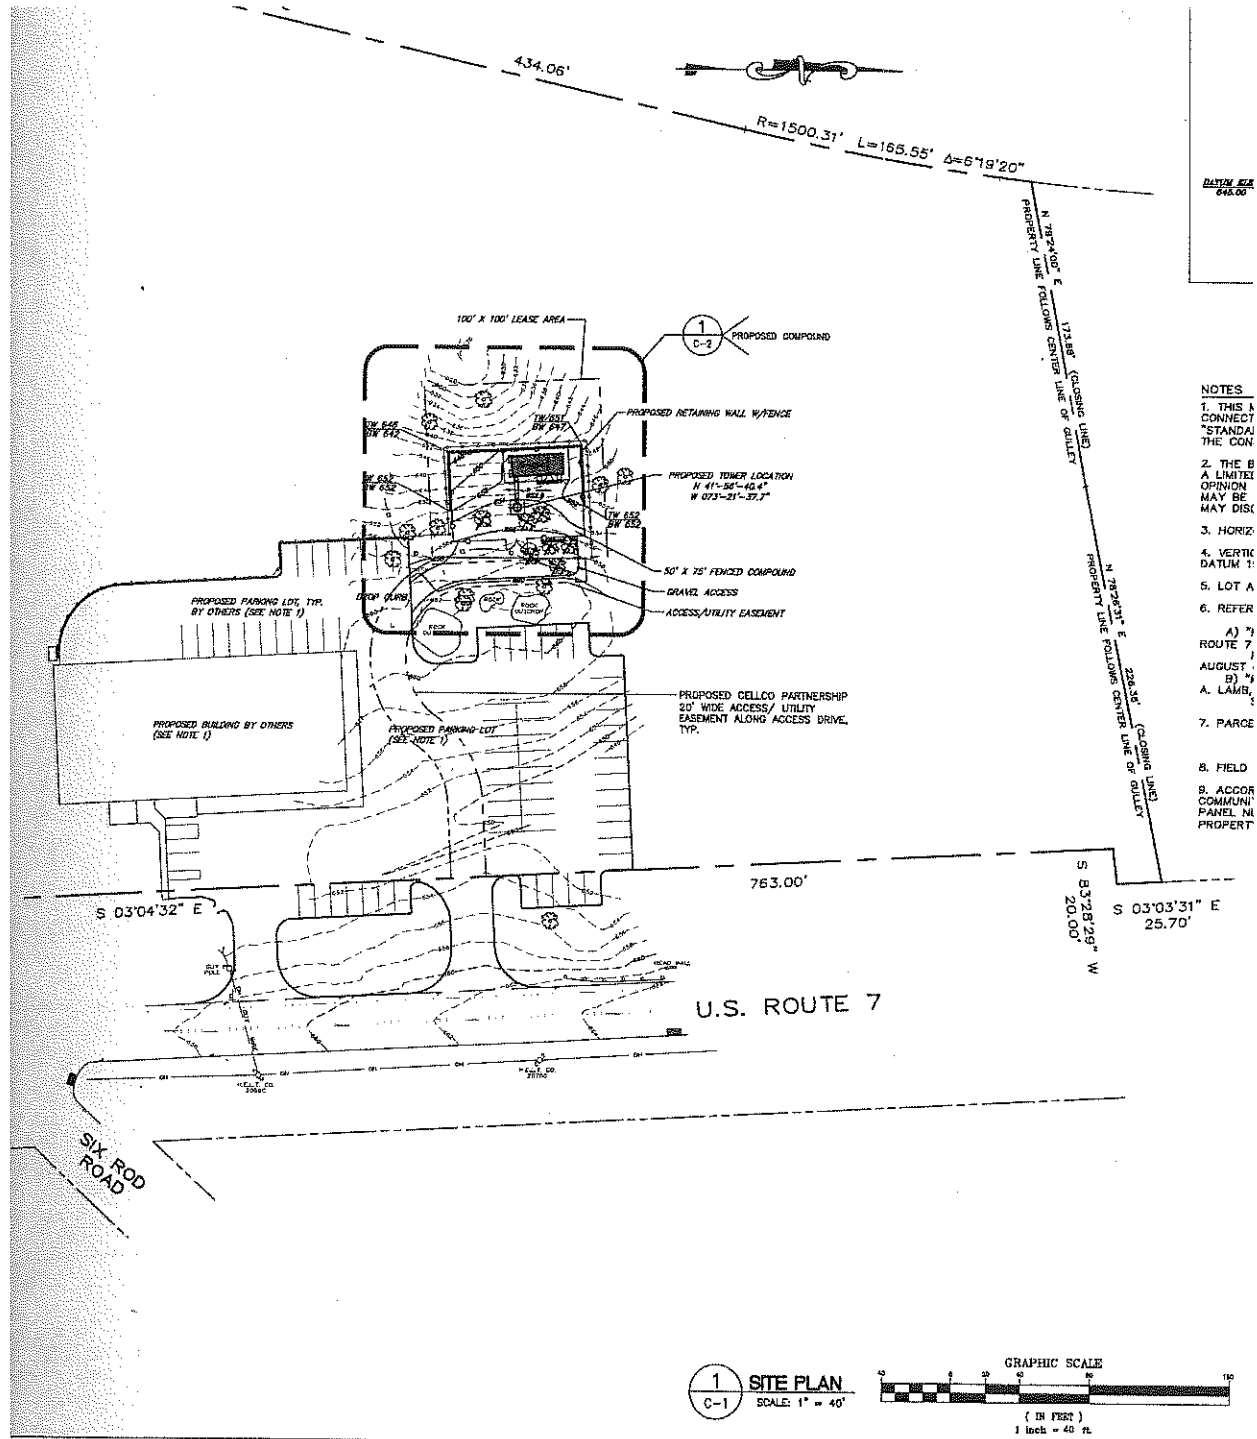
Site plan for proposed site. (Verizon 1, Tab 1)
